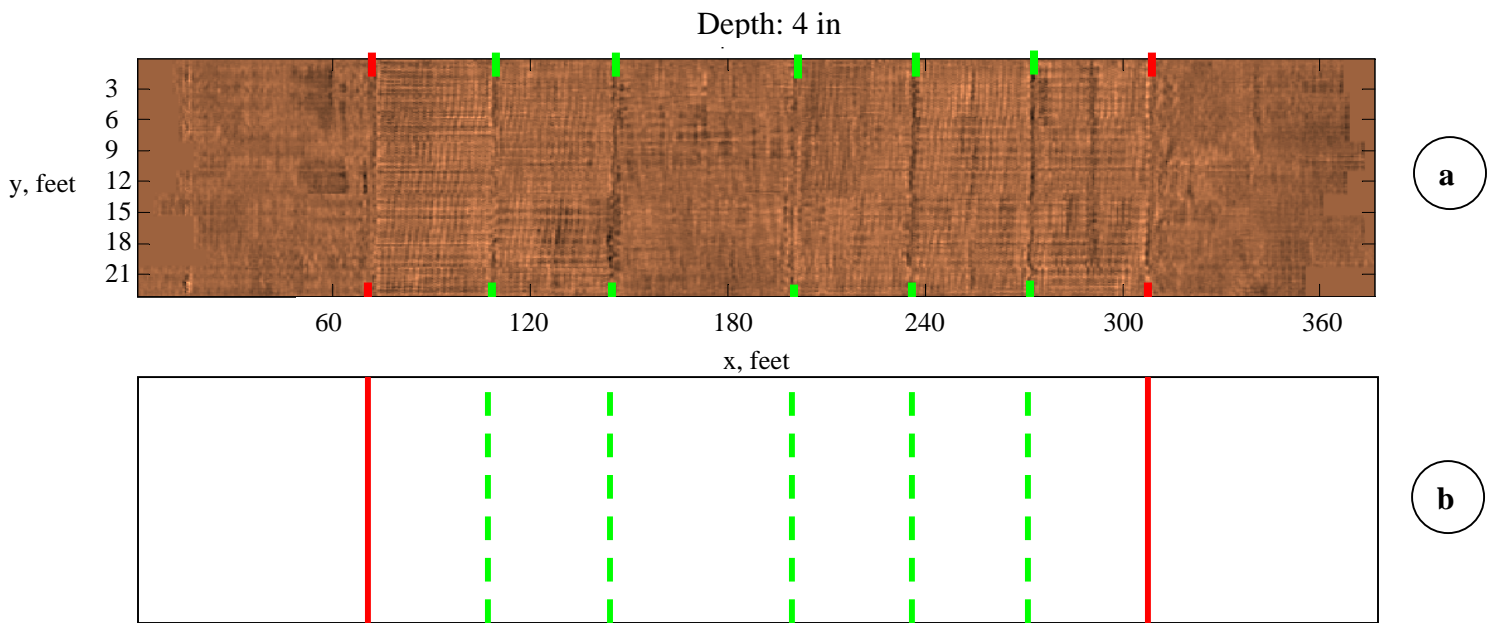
(a) Plan view rendering of subsurface bridge deck features from site 4 bridge deck, including bridge joints in green, (note reinforcing steel pattern within each span), (b) schematic.
